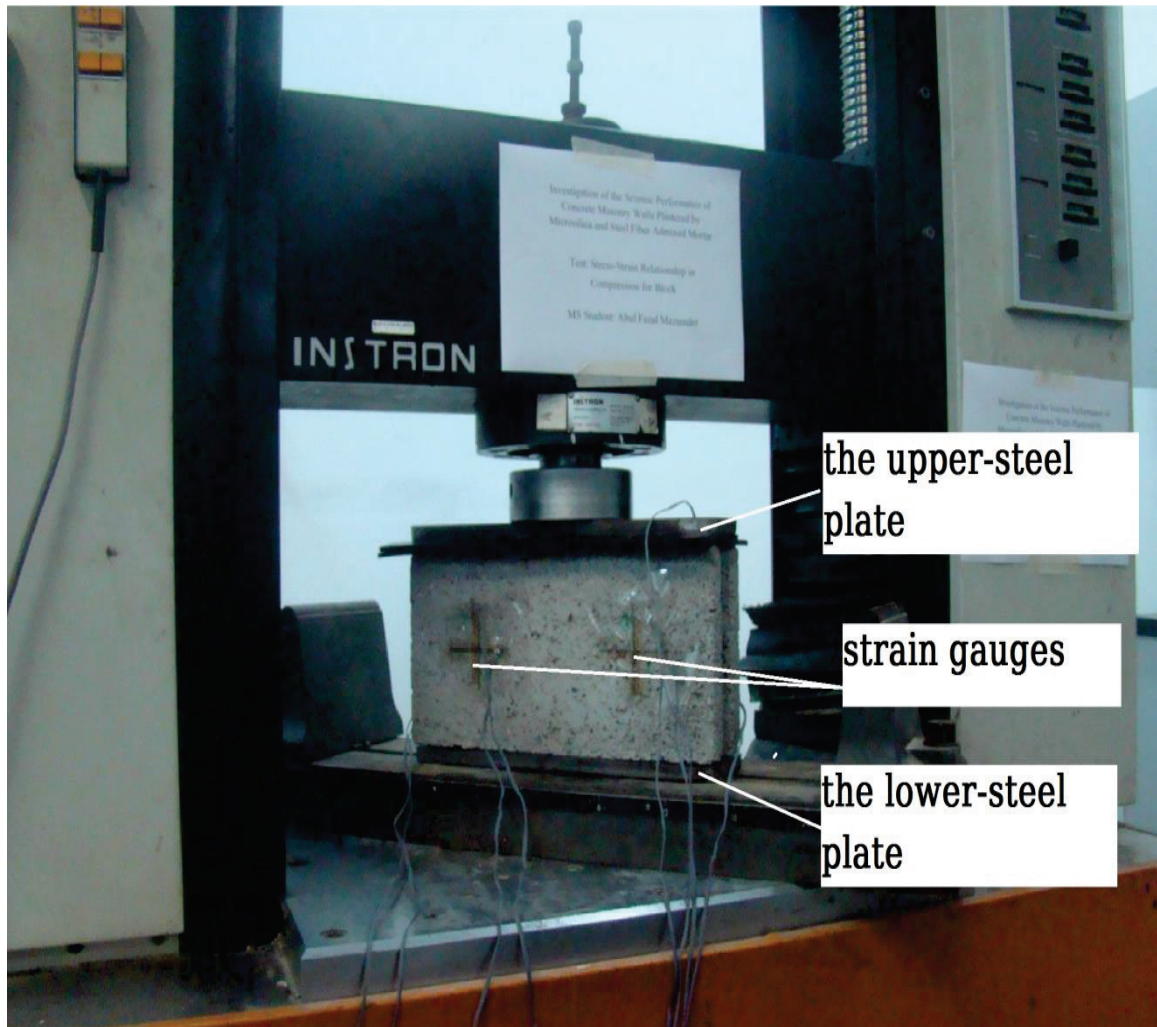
Loading-unloading test for concrete masonry block under compression
